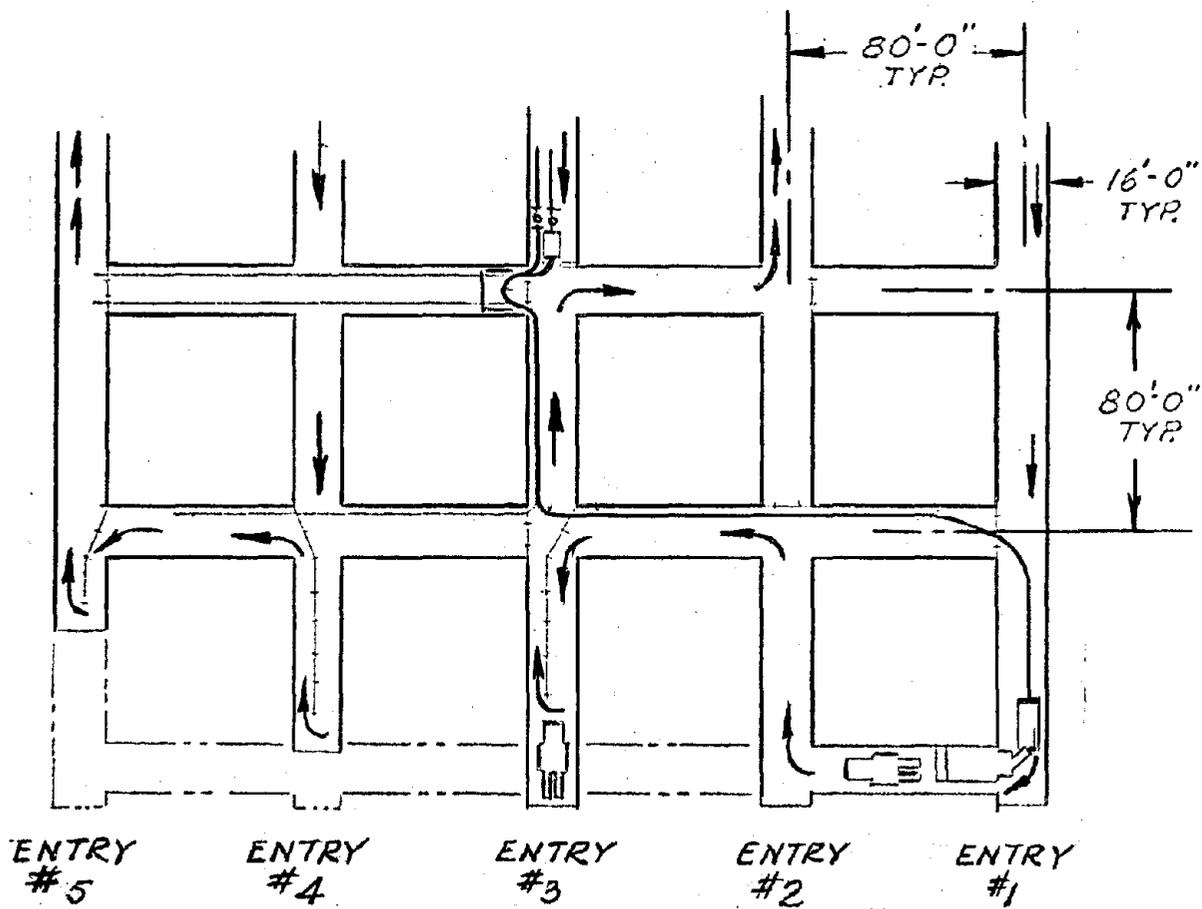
Mine Plan; Last Cut in Entry No. 1
